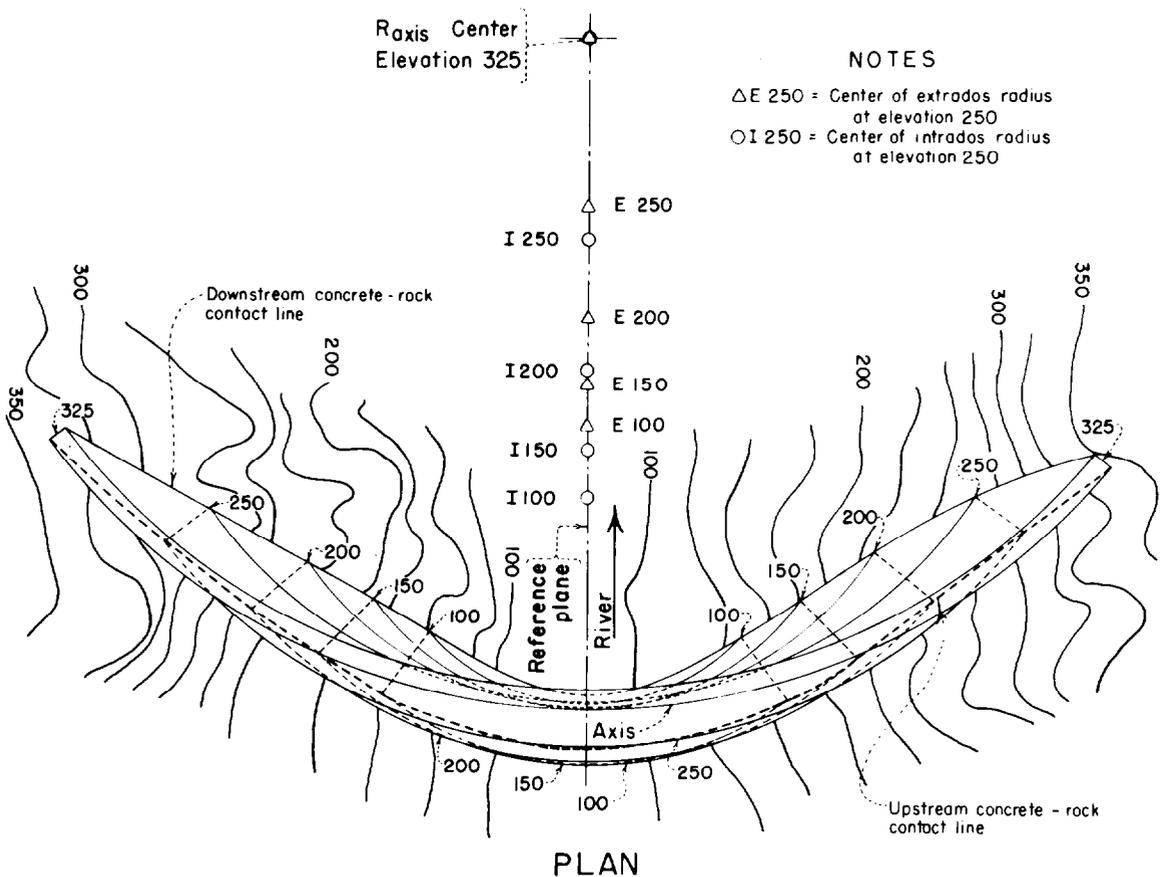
Plan for a preliminary design of a single-centered arch in a nearly symmetrical canyon.—288-D-2962
